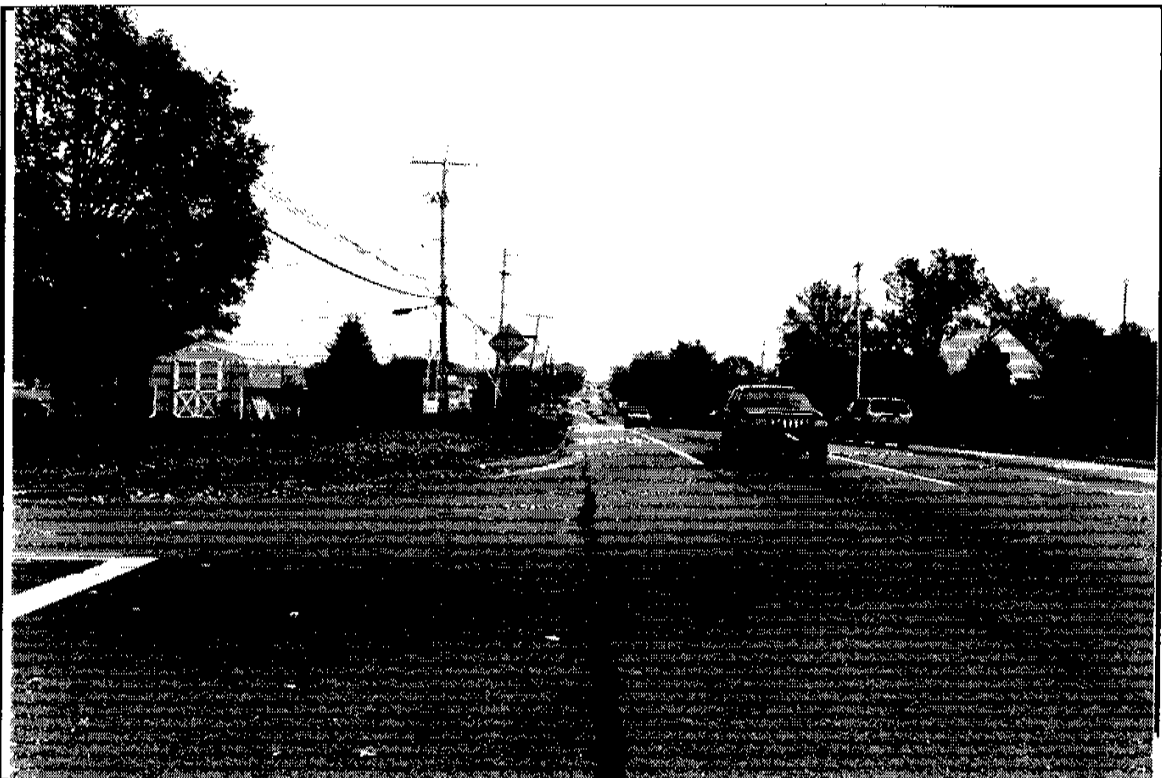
Overview from the southwest project area boundary, looking northeast along Airport Road.
